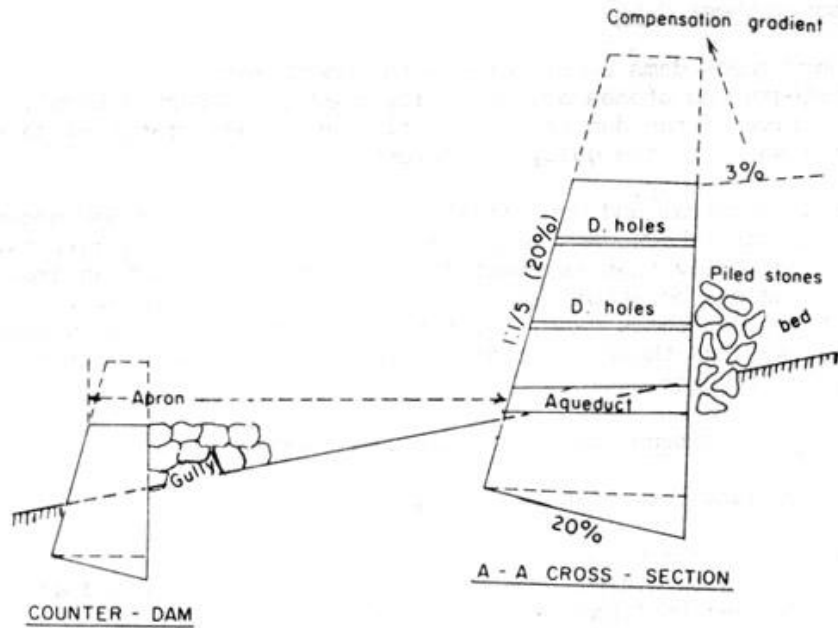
A-A cross section of the first masonry check dam and Counter dam
